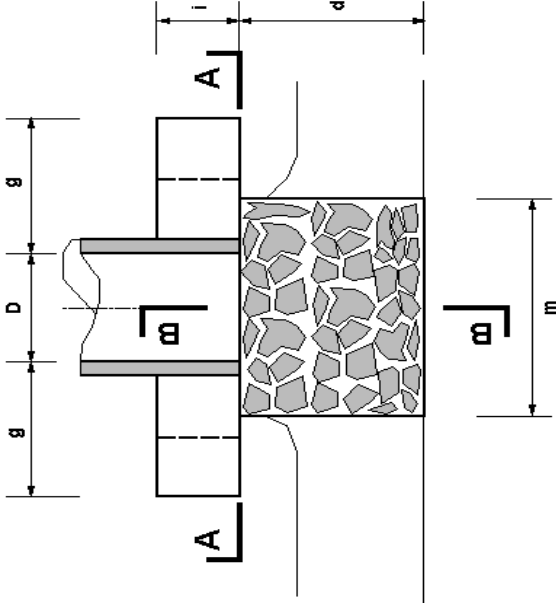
HEADWALL TYPE 3B (STONE MASONRY HEADWALLS)
